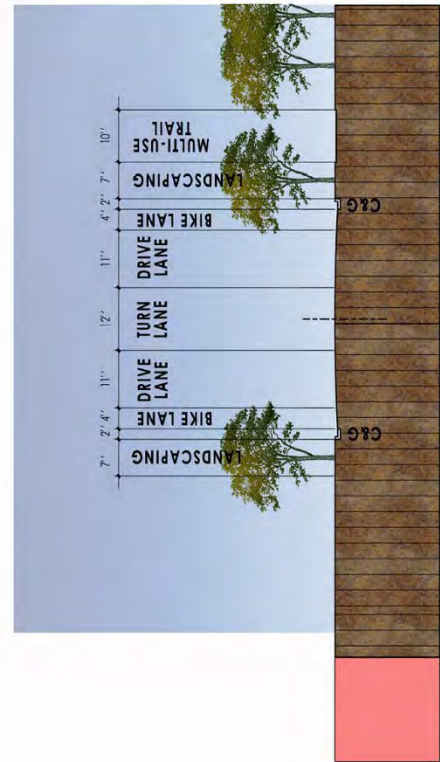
EXHIBIT F: LOOP ROAD TYPES (SECTIONS)
